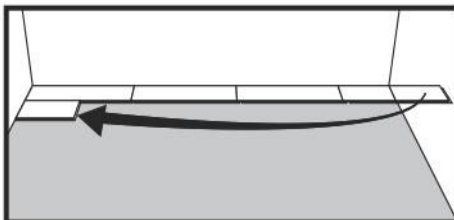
Add the first plank to the second row by positioning the remaining part of the first row's last plank as first plank of the second row. Keep the plank length a minimum of two times the plank width. Keep the same 5/16" (8mm) gap at the row ends against the wall.
